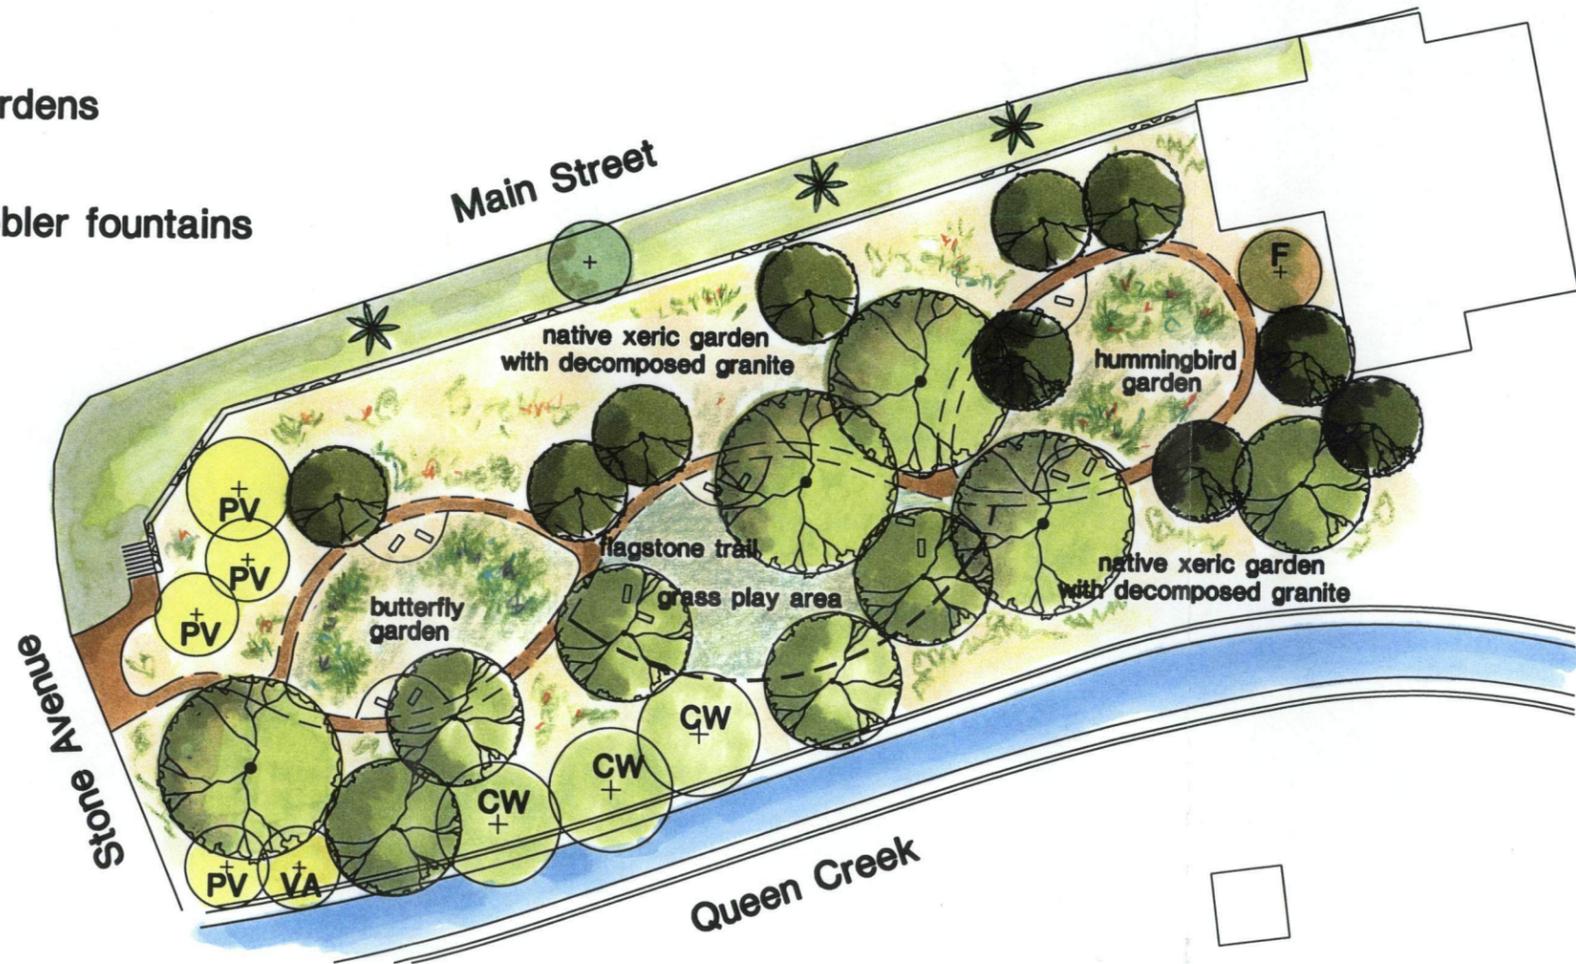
Schematic Landscape Plan for Stone Avenue Park
